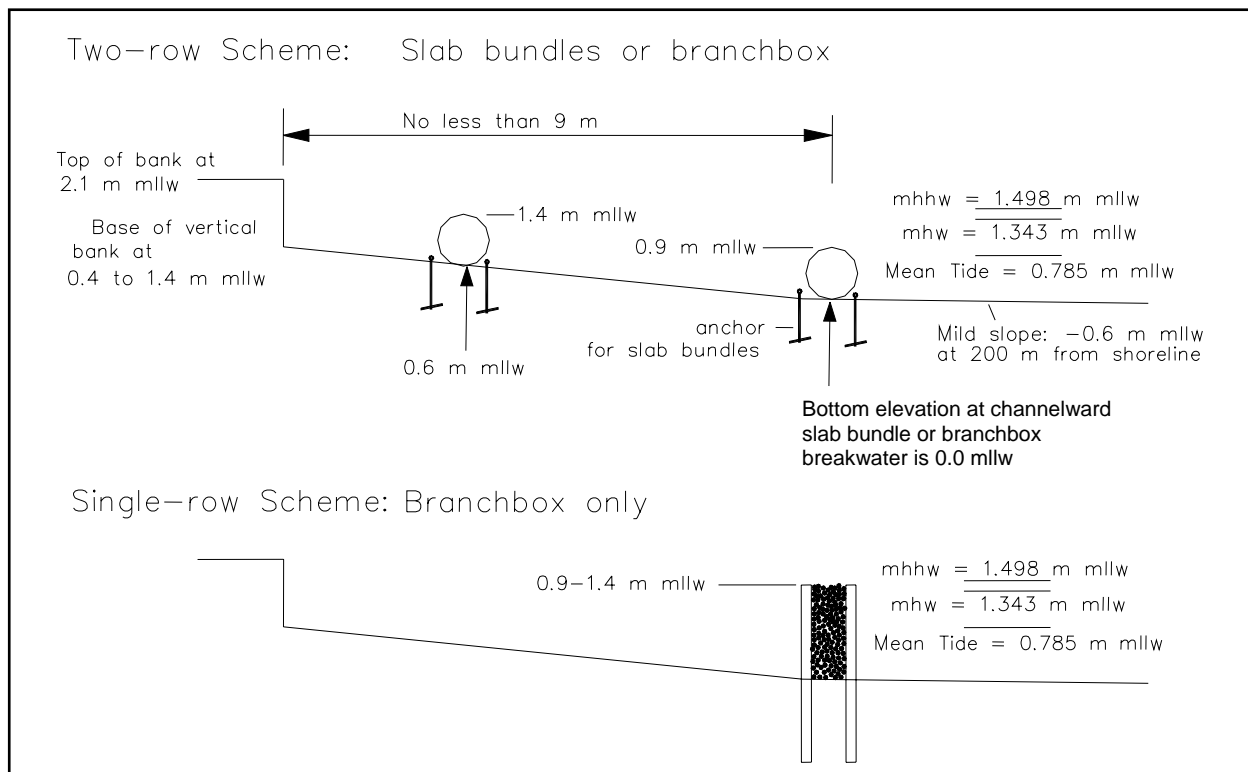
Cross sections of proposed branchbox or slab bundle breakwaters at Martinez
